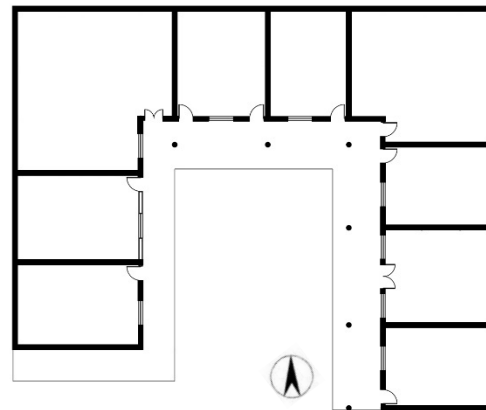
The typical plan layout of the “U”-shaped dwelling
